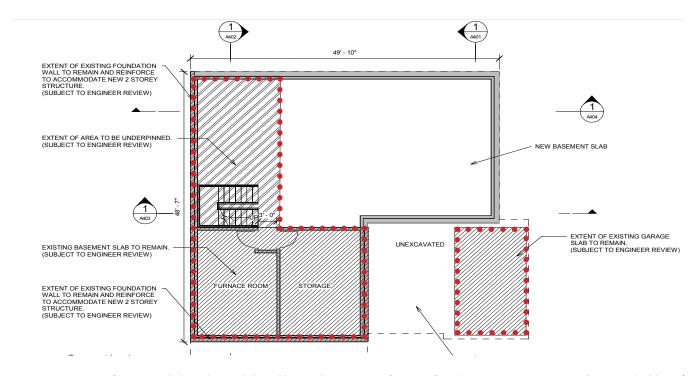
Basement/Lower Level Floor Plan. Red dotted lines indicate existing footprint foundations to remain as part of proposed addition/renovation. Drawing by Third Layer Architects, 2021.
